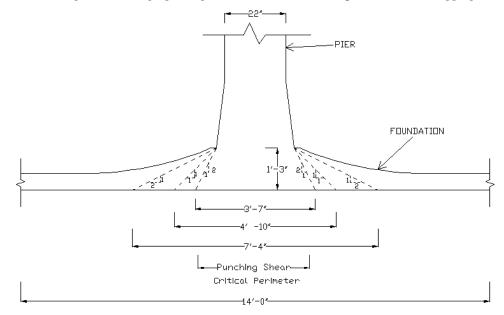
FOUNDATION SLAB: EQUIVALENT SPREAD FOOTING
